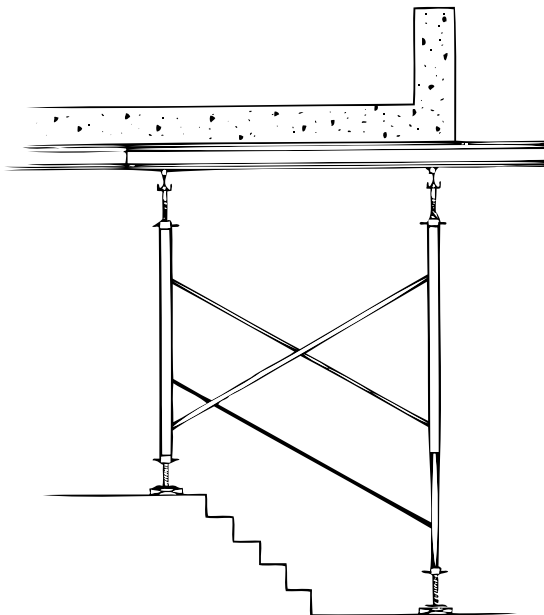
Shoring with changes in base elevations. Note inverted base and extension frames.
